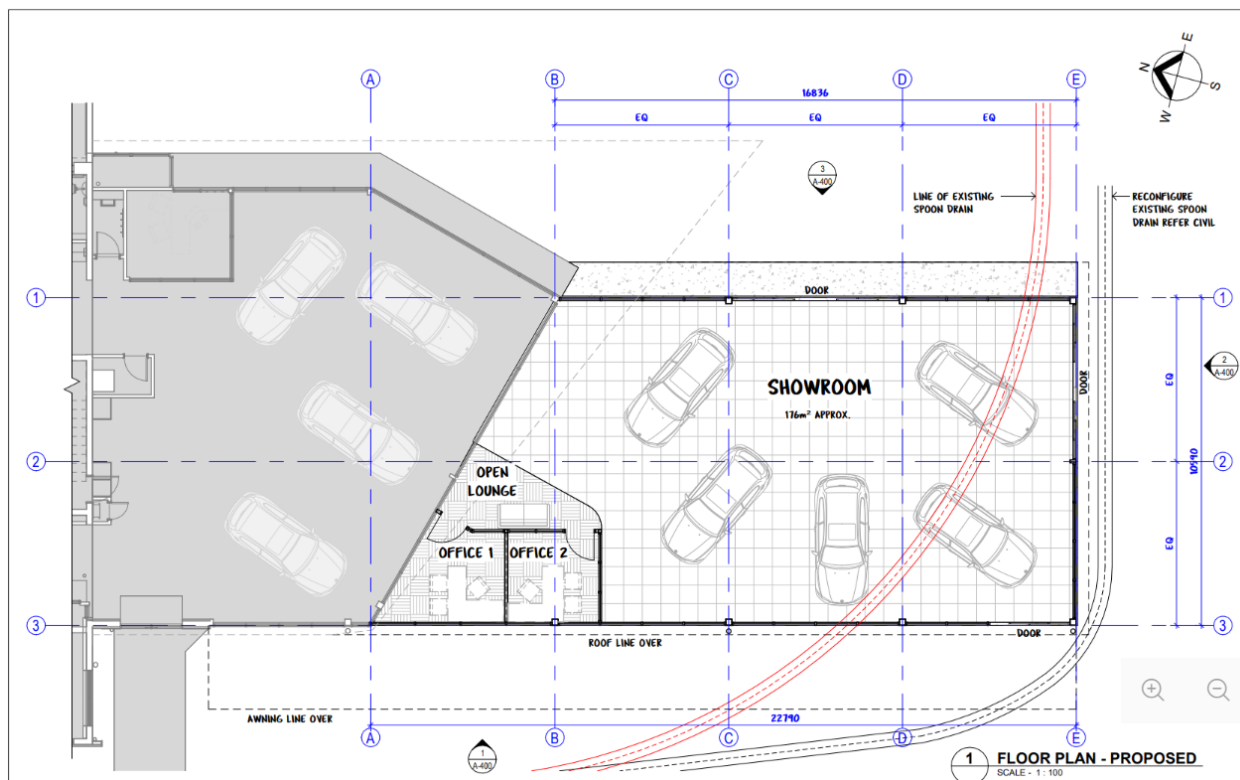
Extract from Development Plans (Prepared by Clark and Prince Architects)
